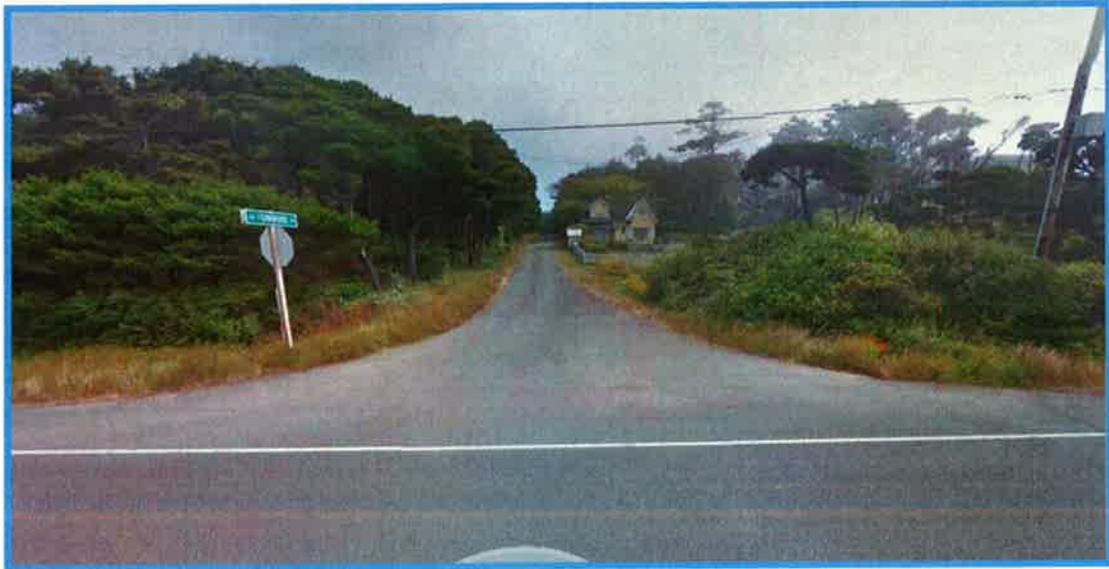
Access Road #2 at Highway 101 Intersection
